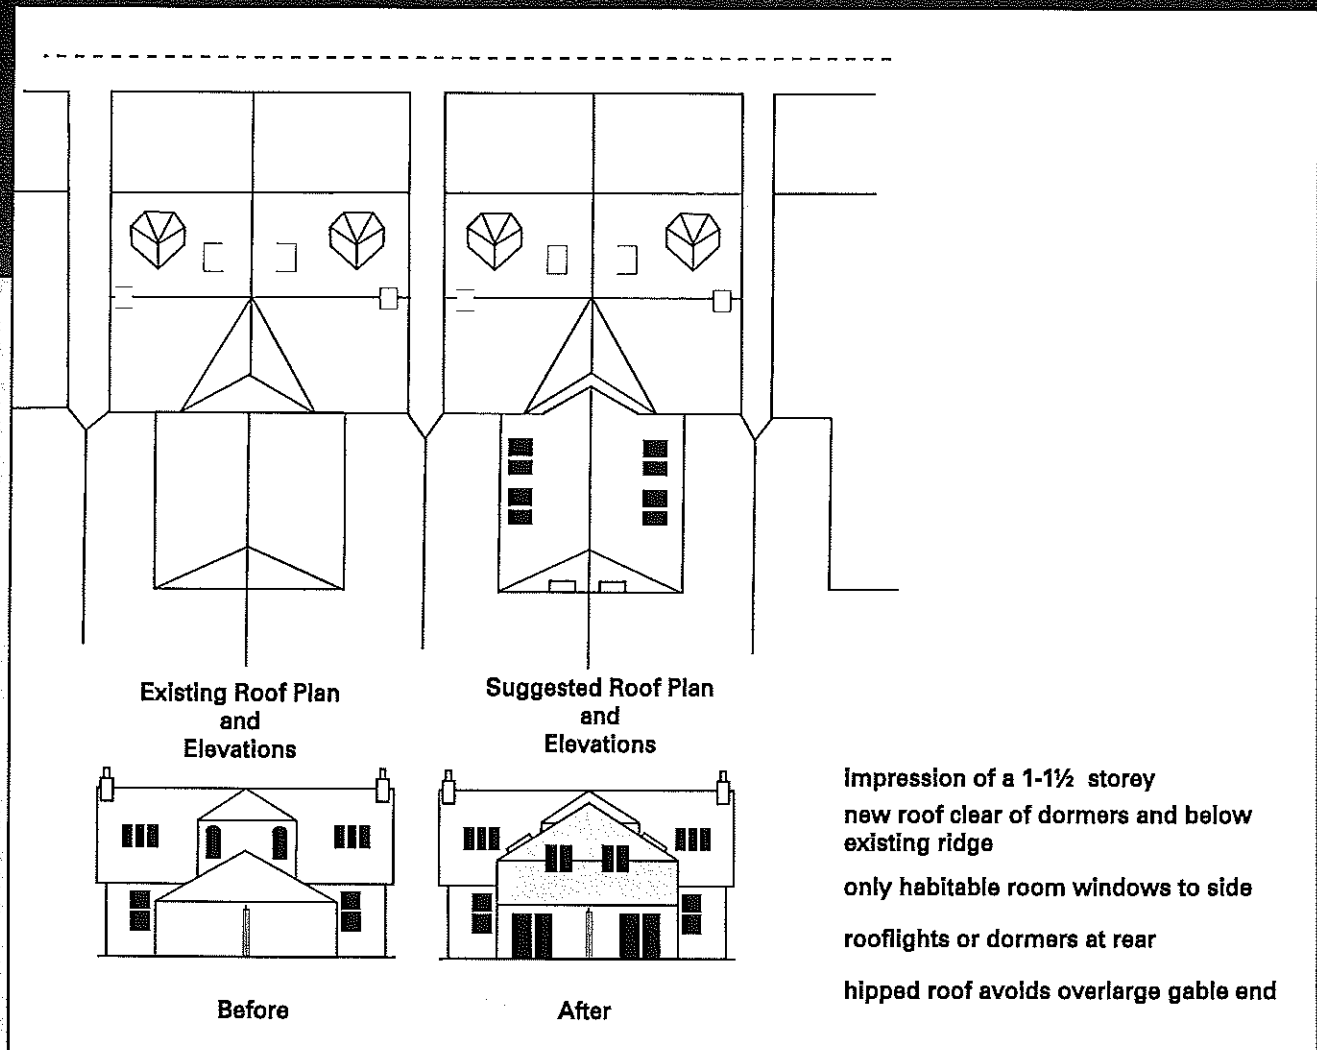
"HALF-COTTAGE" - Advice: adding upper floor to original single storey portion at rear where executed jointly with neighbour
